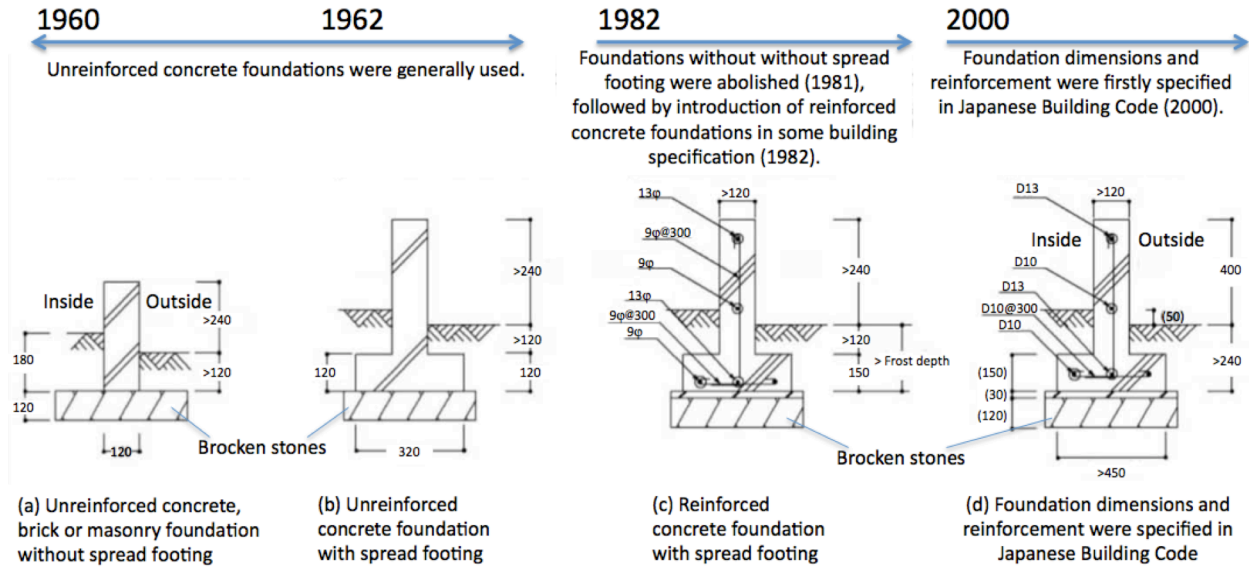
Historical changes in recommendation of continuous foundation design of wooden houses (in mm)
